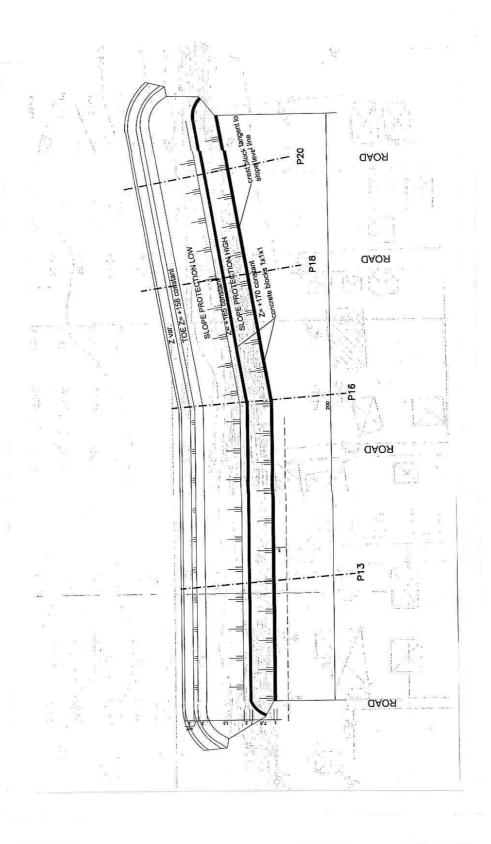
General Layout of Riverbank Protection Work at Bo O Site
